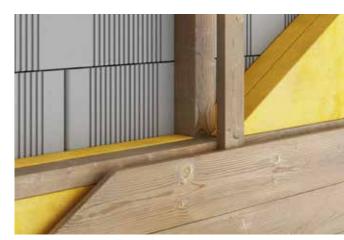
DETAILED INFORMATION: SUBSTRUCTURE FACADE
